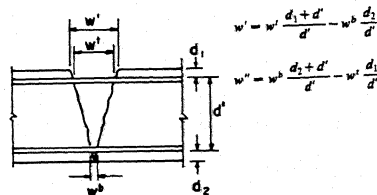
COMPUTATION OF CRACK WIDTH AT THE TOP AND BOTTOM OF A CRACKED R/C SECTION
